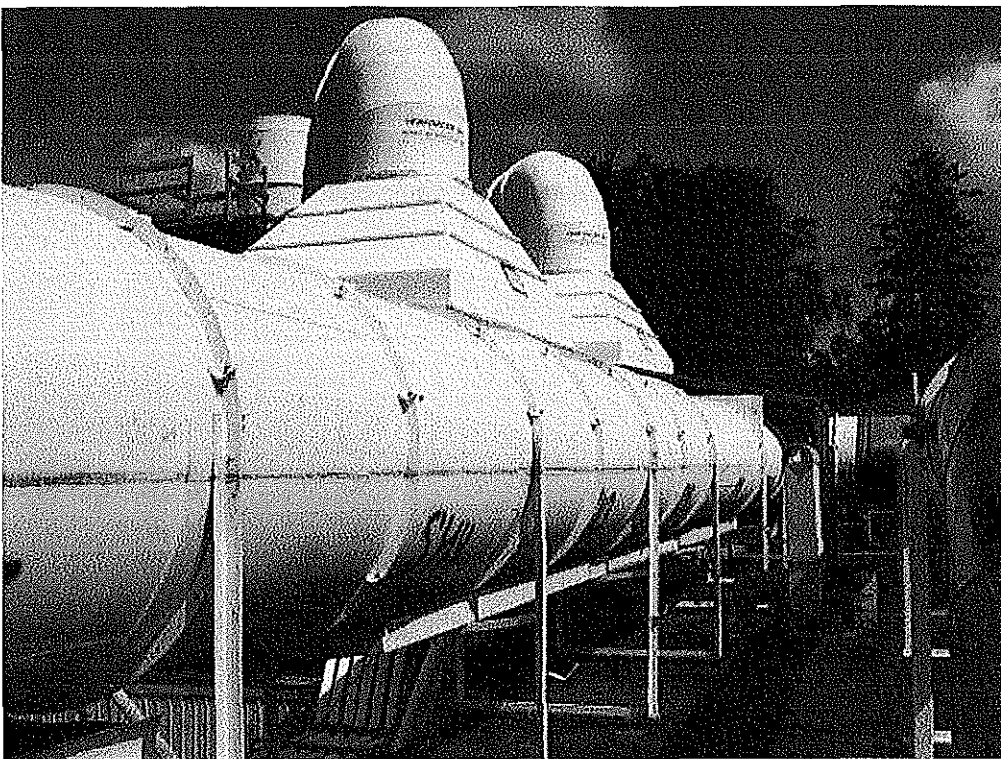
(003) : West ductwork on east roof, scrubbers #3 and 4.
